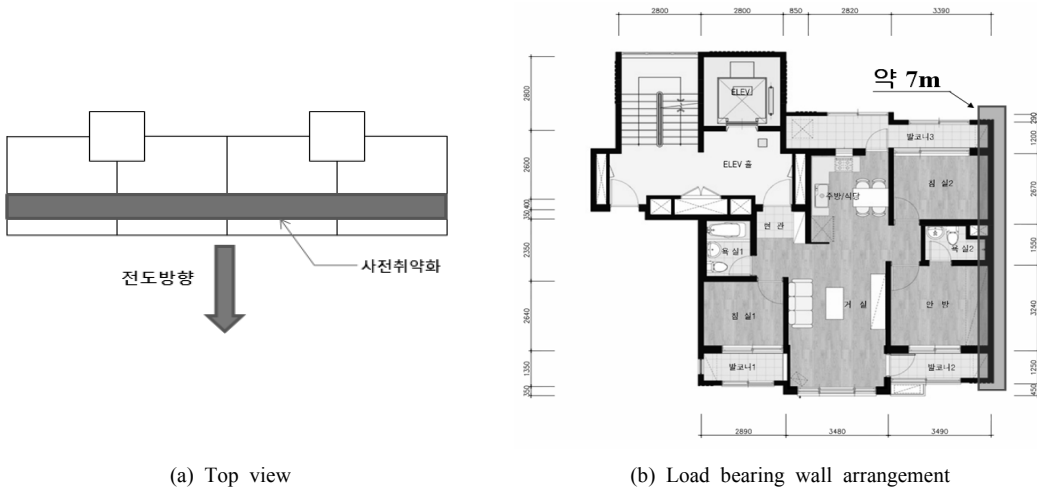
Blasting plan of structure constructed using load bearing wall system.
